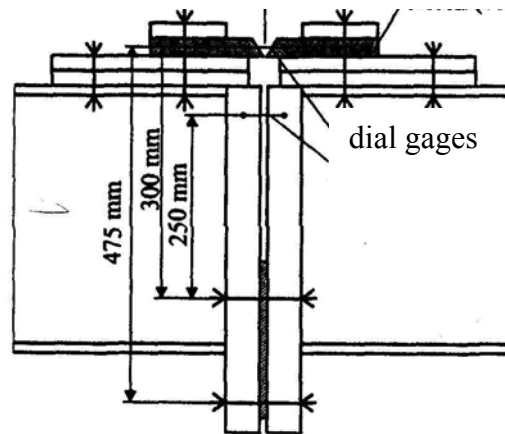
Details of the test set up for the welding in moving weld seams
